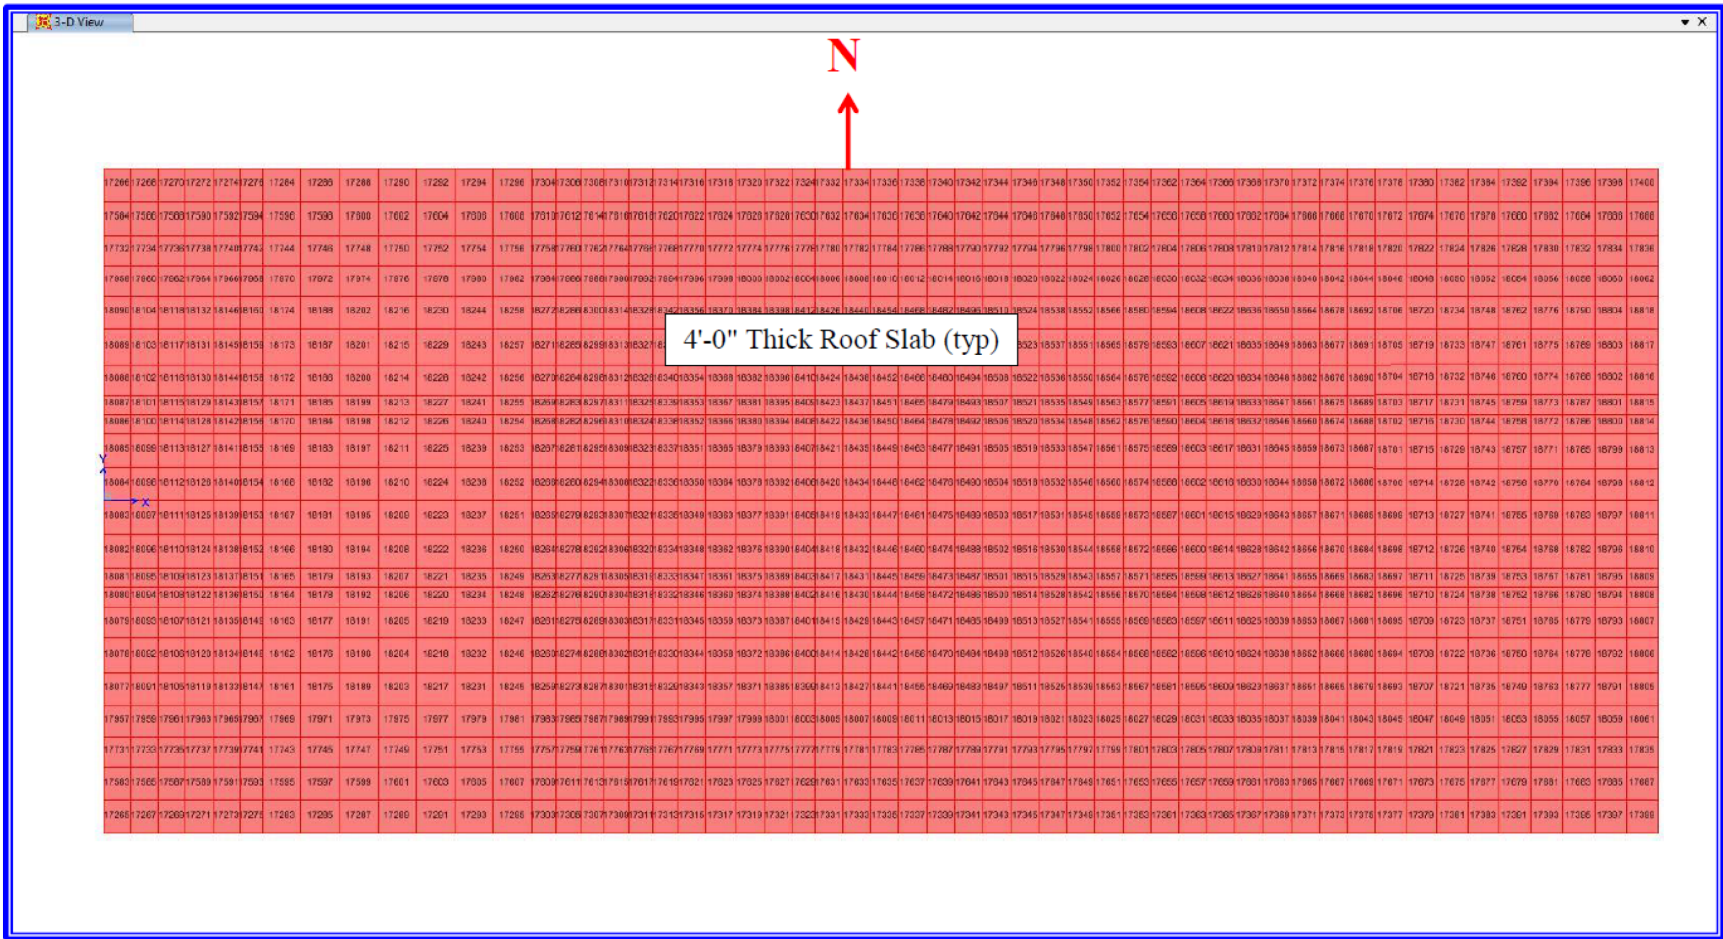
B-29: RXB Reinforcement Plan for Roof Slab
